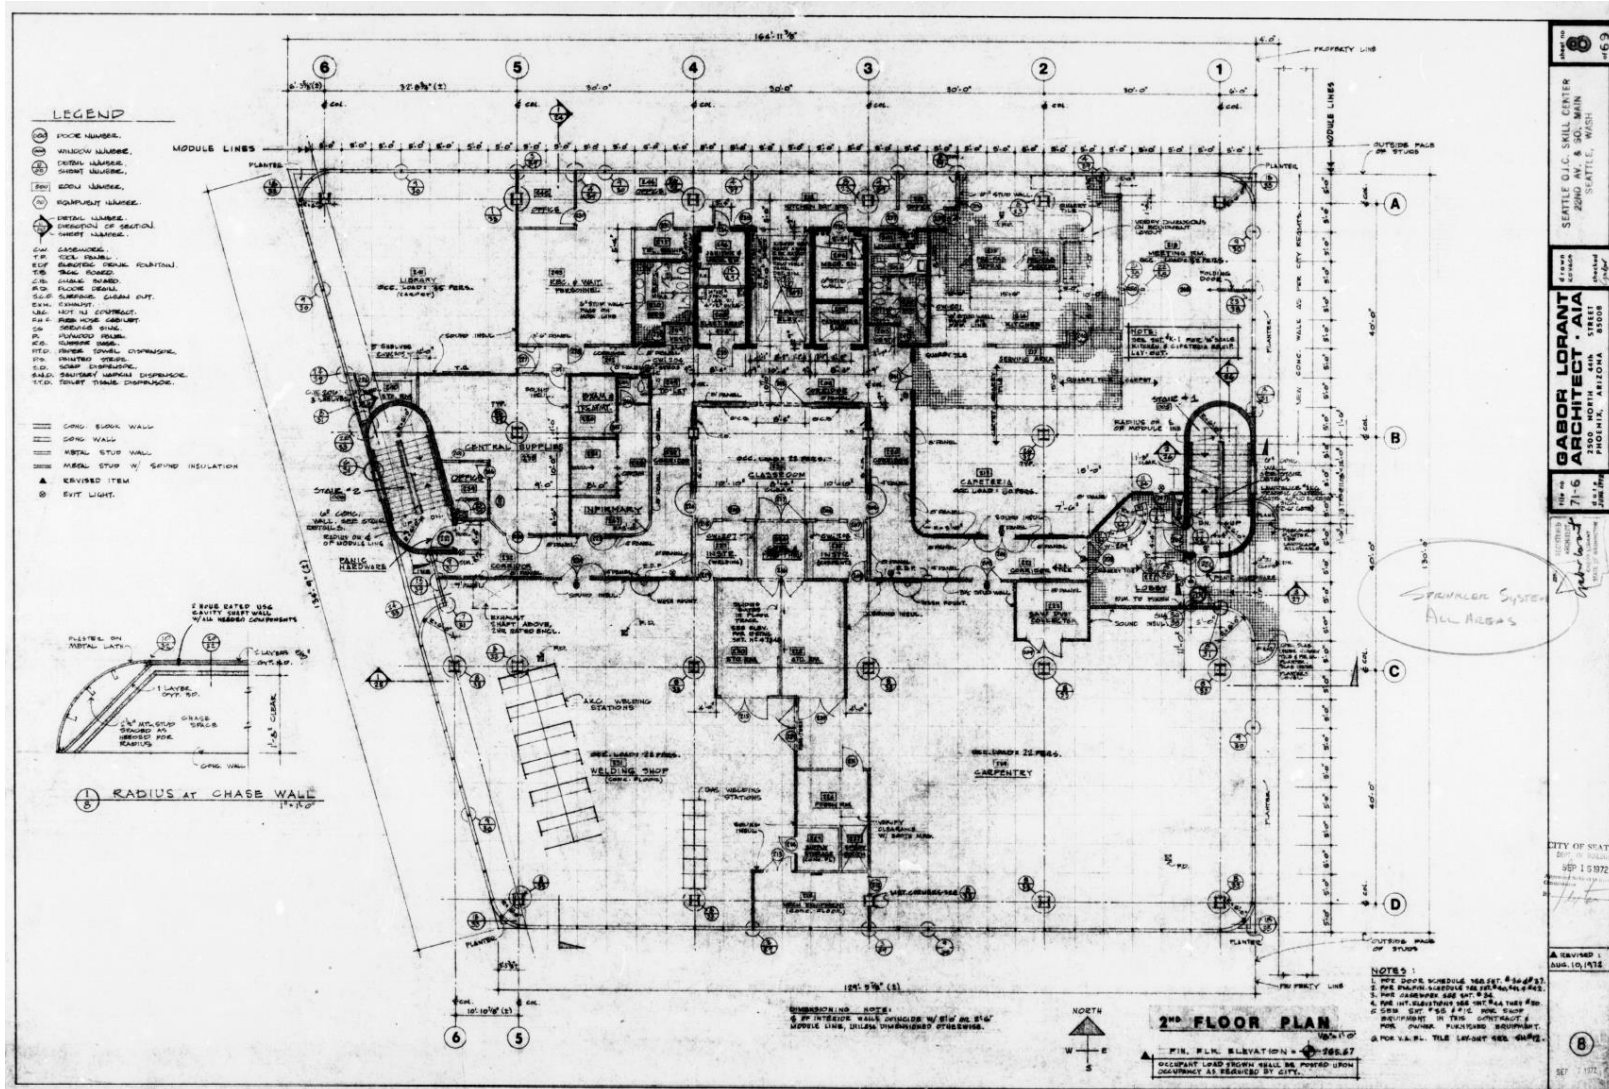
Second Floor Plan by Gabor Lorant, 1972
